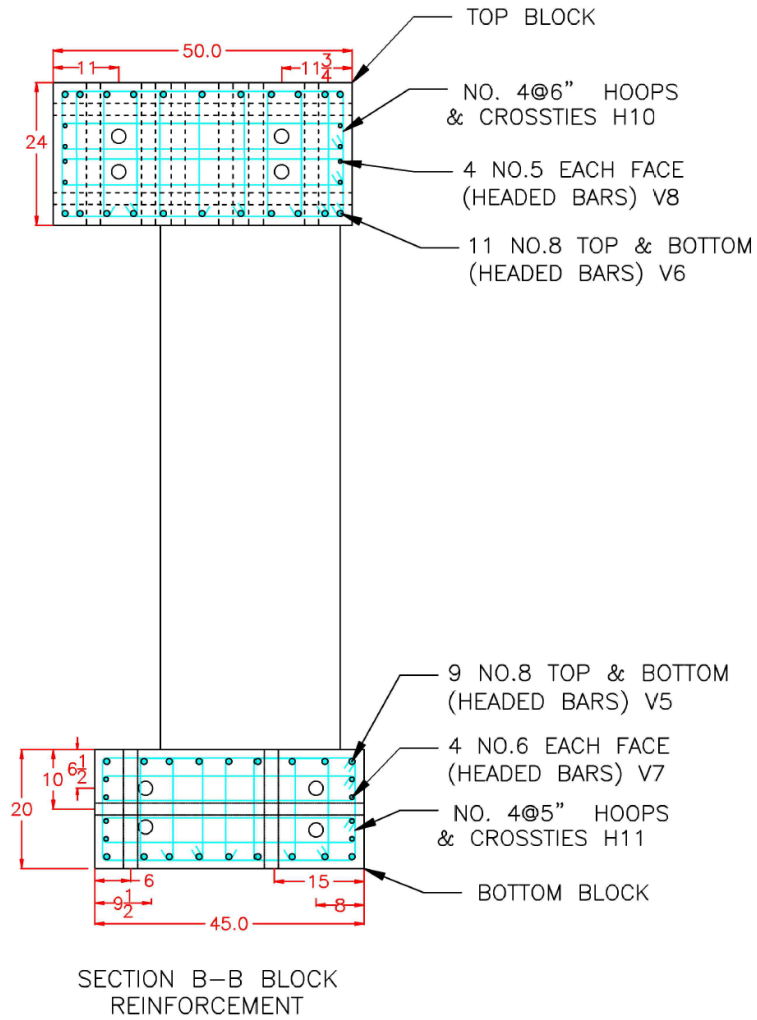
Blocks Longitudinal and Transverse Reinforcements
